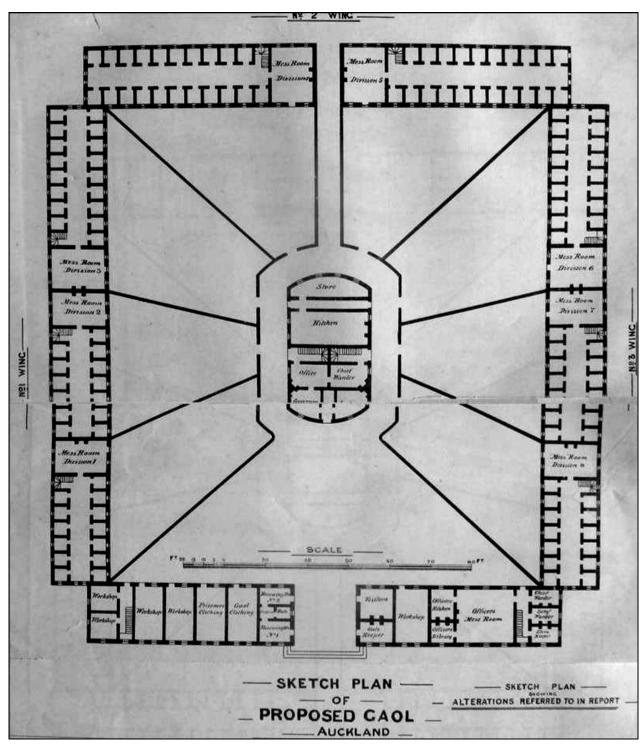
Mahoney's 'Sketch Plan of Proposed Goal Auckland', which was based on O'Brien's plan  $AJHR\ 1877$ : H30
